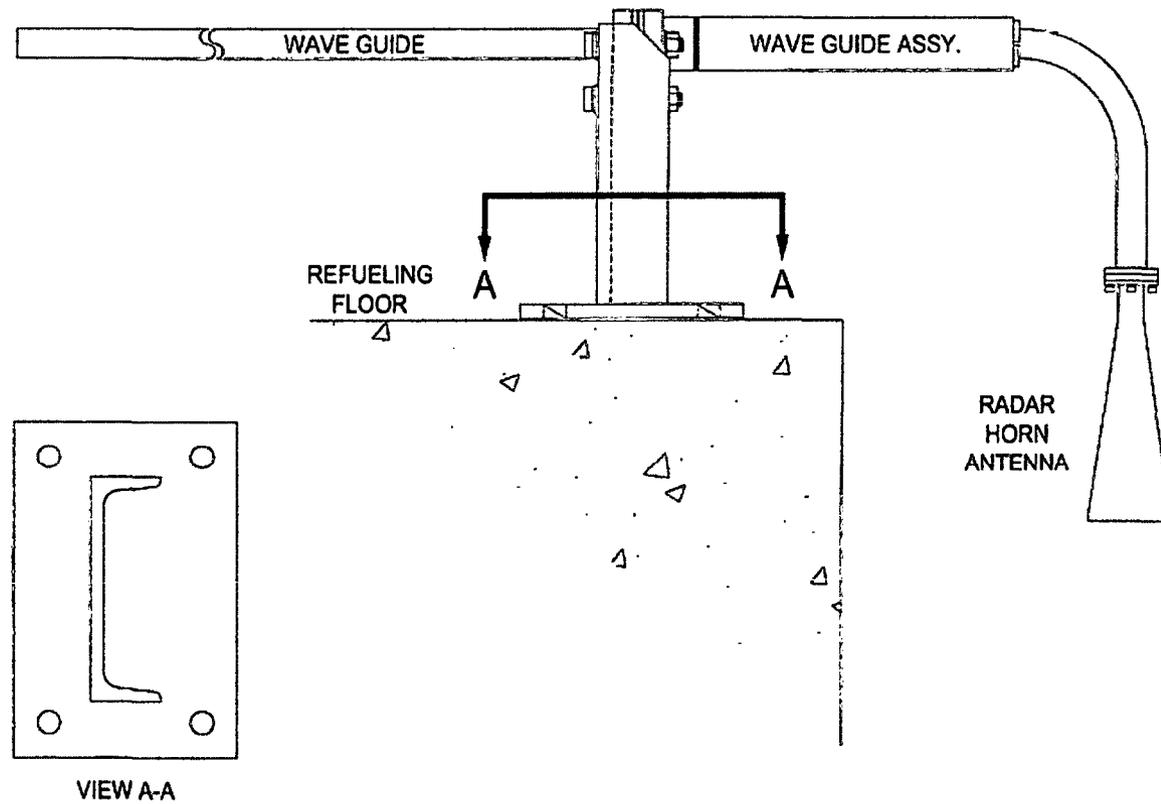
Radar Horn Pool Edge Mounting Configuration
